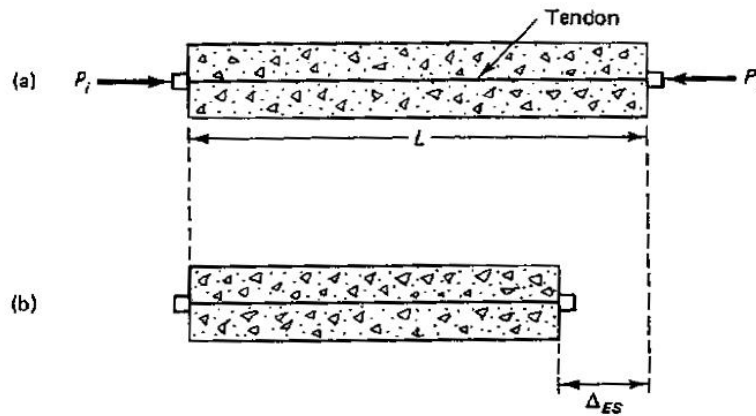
Elastic shortening. (a) Unstressed beam. (b) Longitudinally shortened beam.
